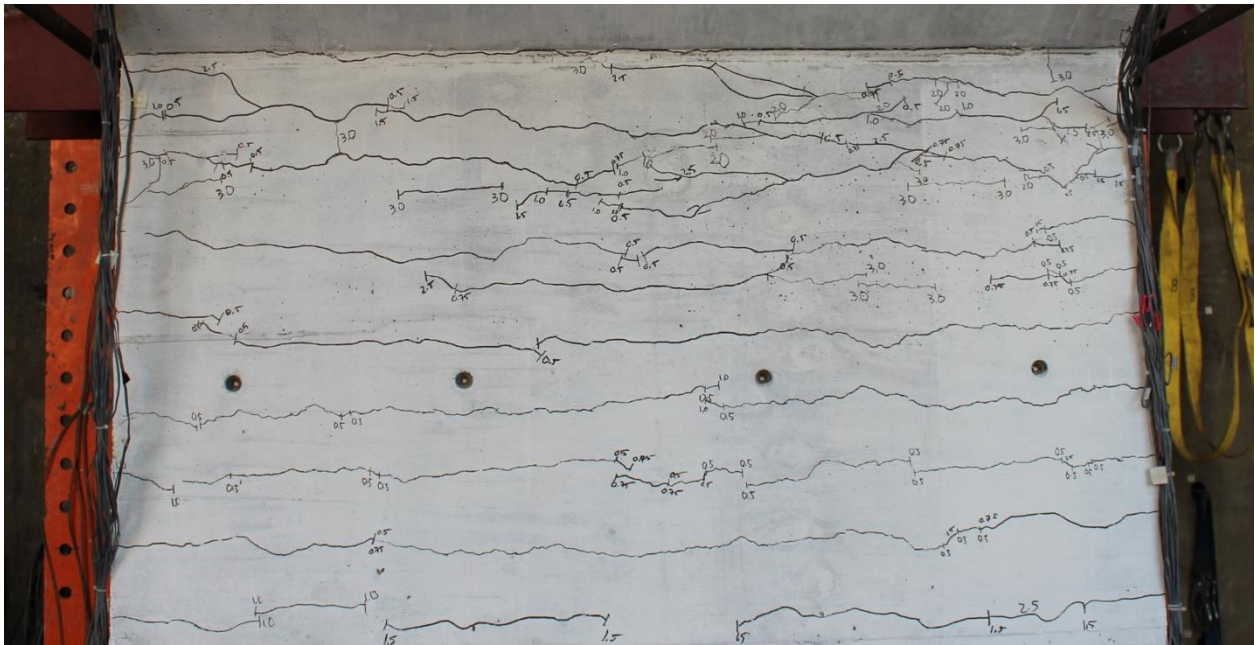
Extension of flexural cracking, cracks span width of tunnel at roof/south wall interface during positive extension at 3.0% drift ratio (Cycle 15-16). Picture of inside South wall at roof looking South
